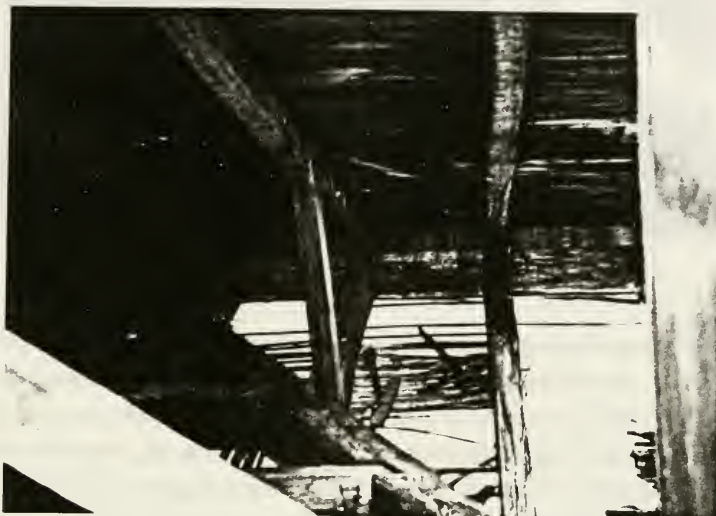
Federal Main Mass Diagonal Framing of Attic Joists
